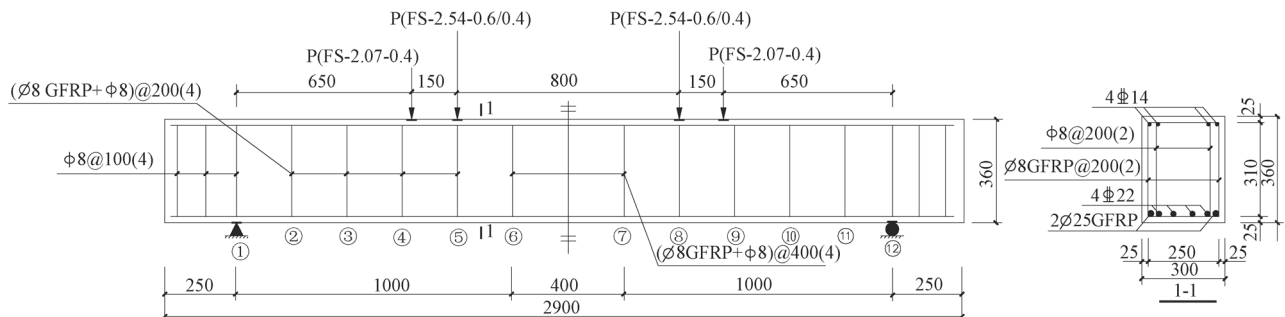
Specimen dimensions and reinforcement details (note: all dimensions in millimeters; all clear covers = 25 mm).
